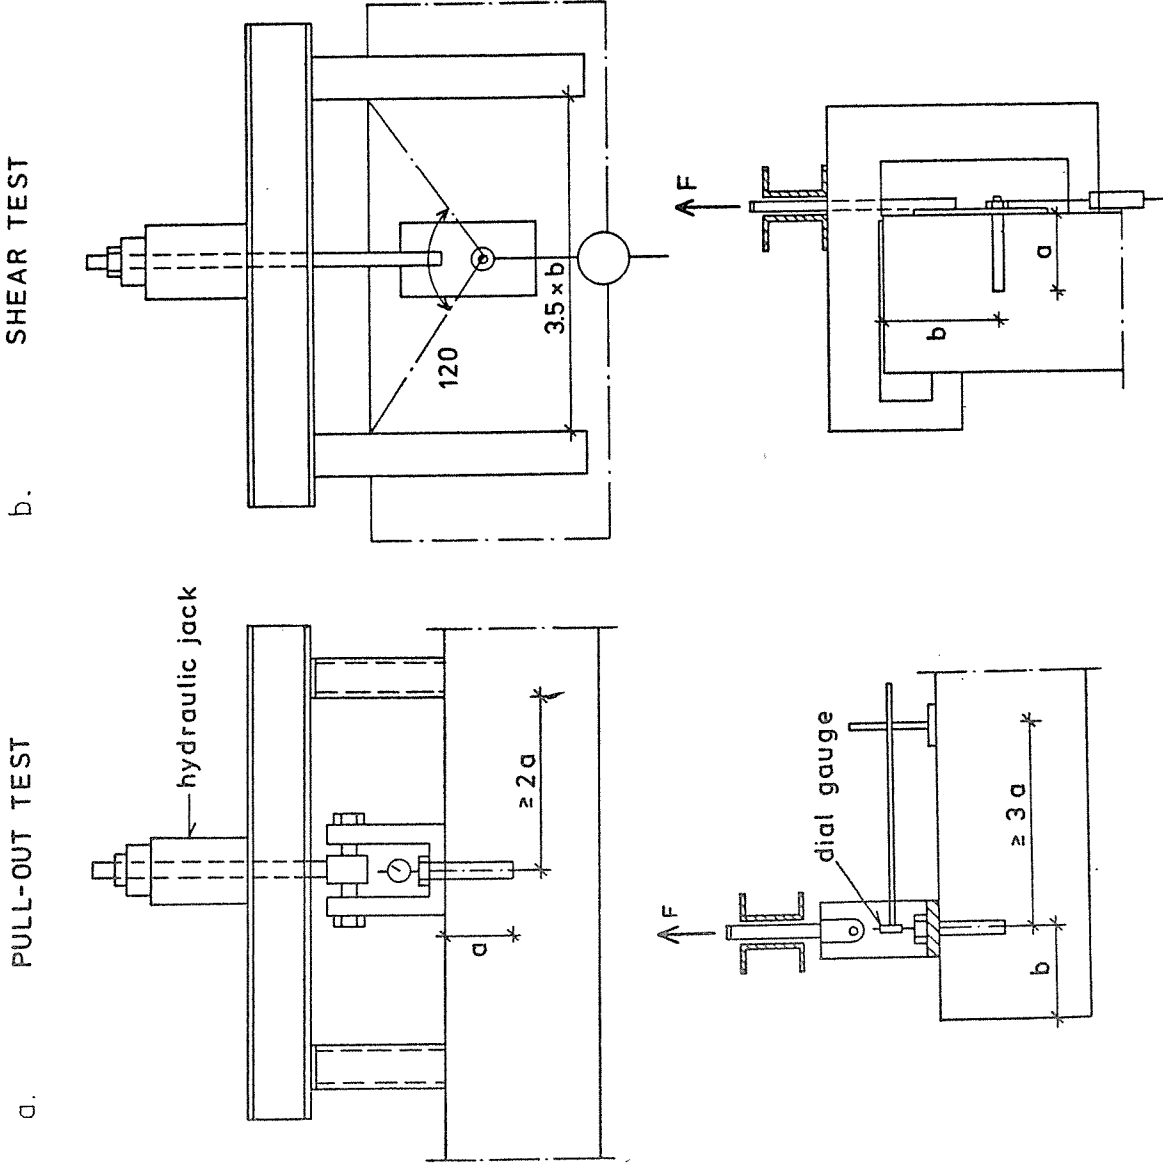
Loading arrangement for type tests on expansion anchors:
